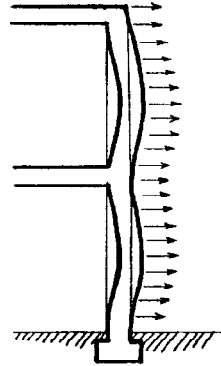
Schematic behaviour under seismic loads of a wall well connected to floors.
